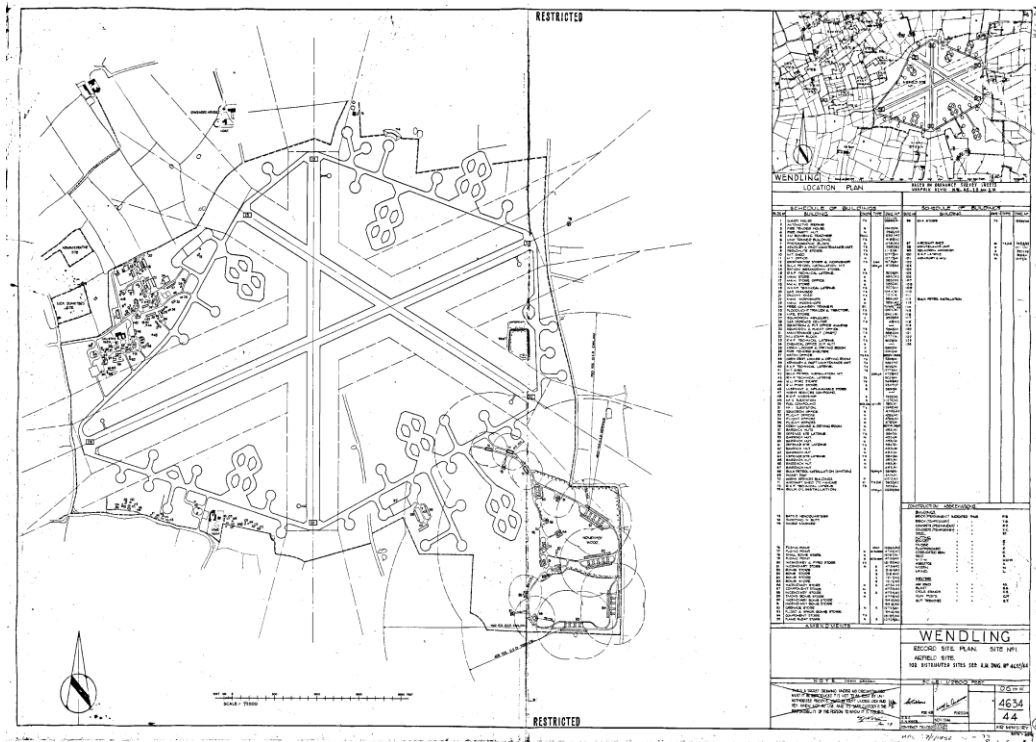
RAF Wendling: standard site plan showing 'A' plan runways and identifying dispersed sites³⁹
